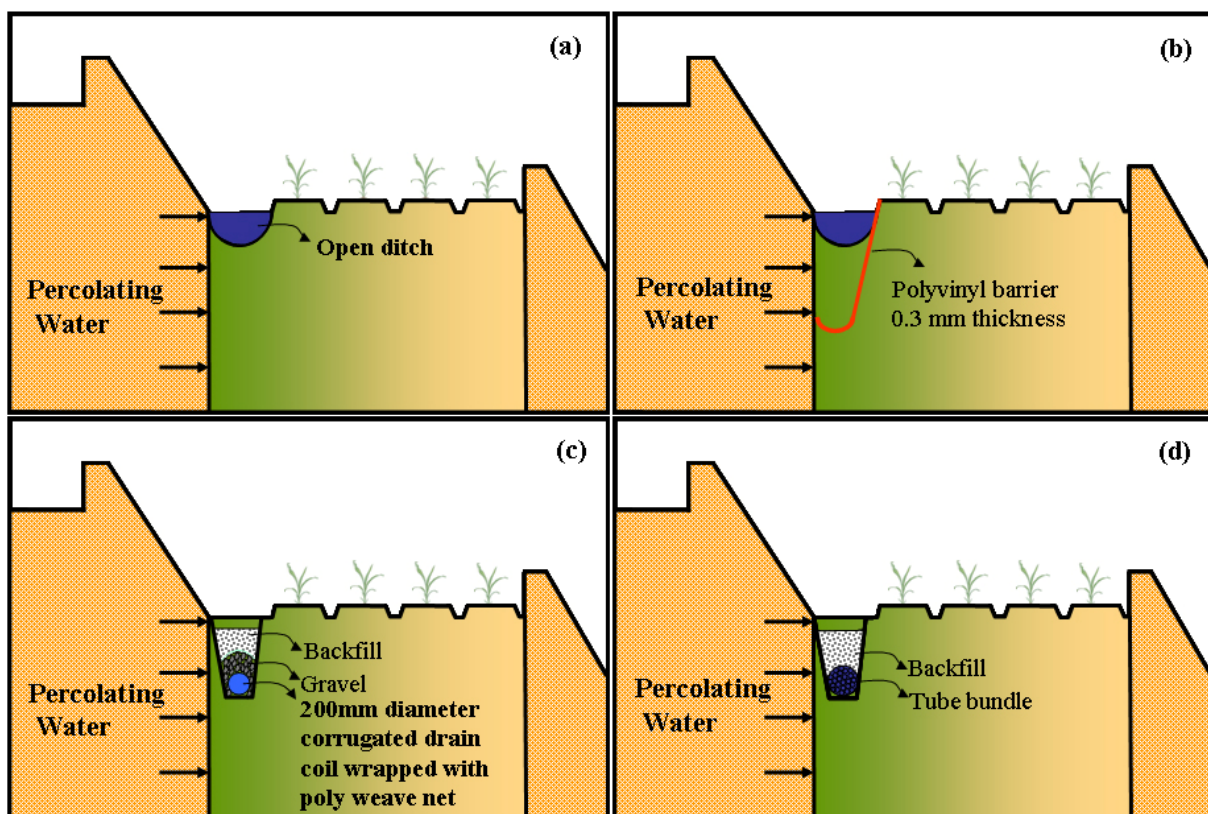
Schematic showing various drainage system. (a) Open ditch (b) Vinyl barrier (c) tile drainage (d) Tube bundle.
